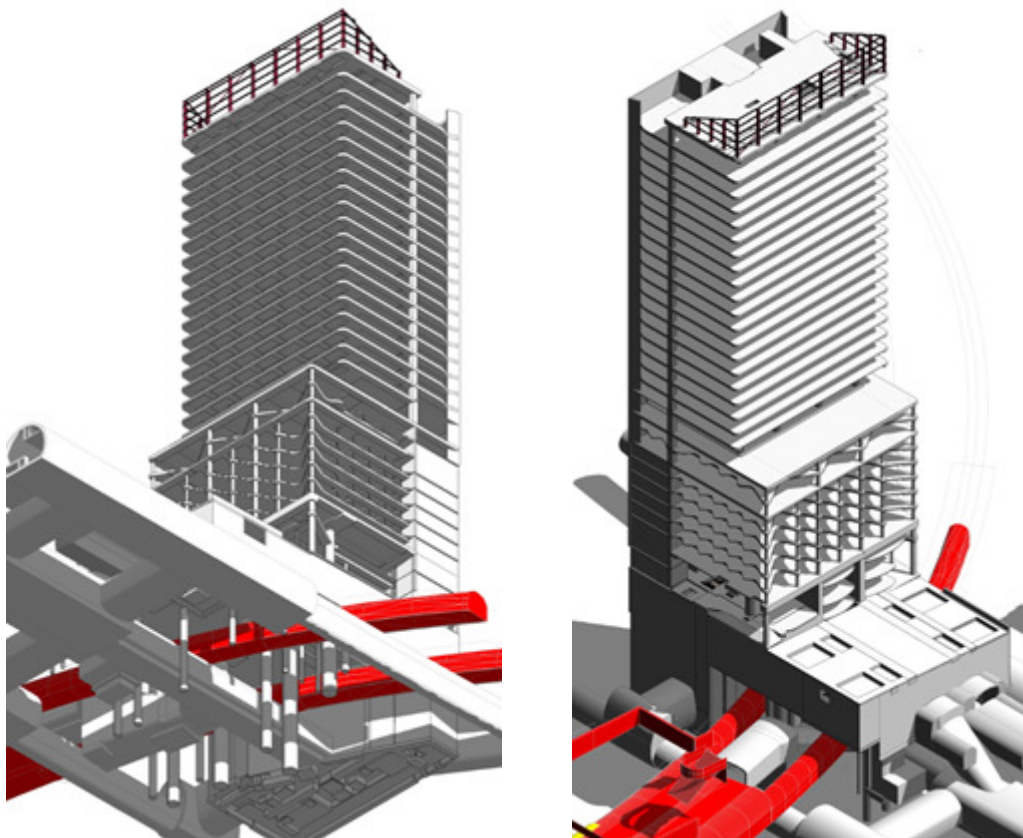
South Tower and station structure integrated and designed from foundation to roof top with new and existing (red) tunnels beneath
